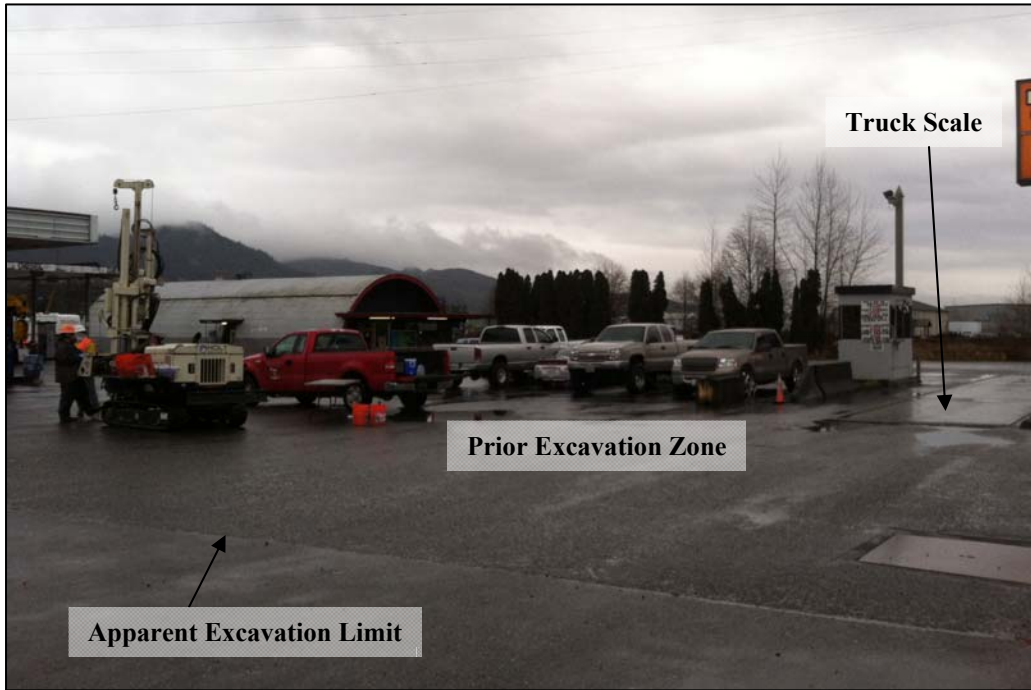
Borehole B-3 in progress. West pump station to left, truck scale to right. Looking Southeast. Apparent limit of prior excavation zone in foreground.
